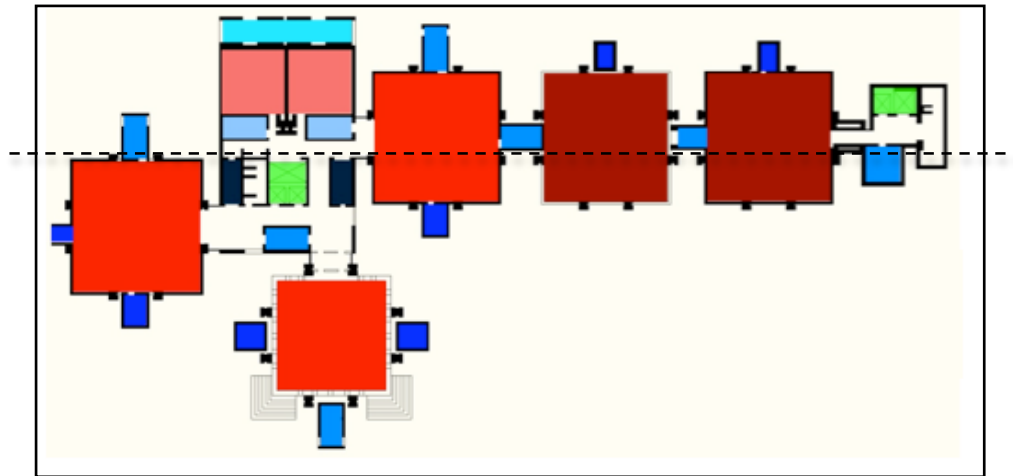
Richard Medical Building, Ground Floor Plan (Drawn by Author)
